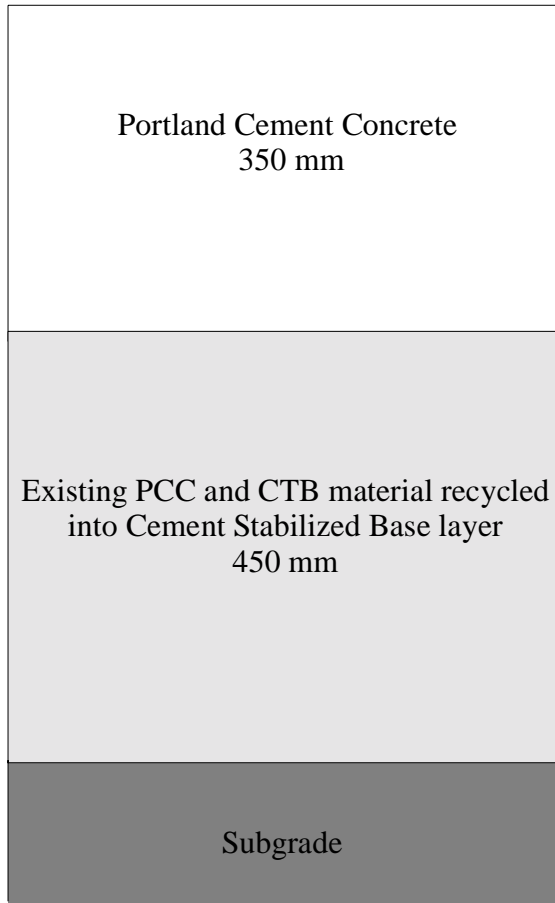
Rigid pavement structure proposed by Yellow team for areas without sufficient support for an unbonded PCC overlay.
